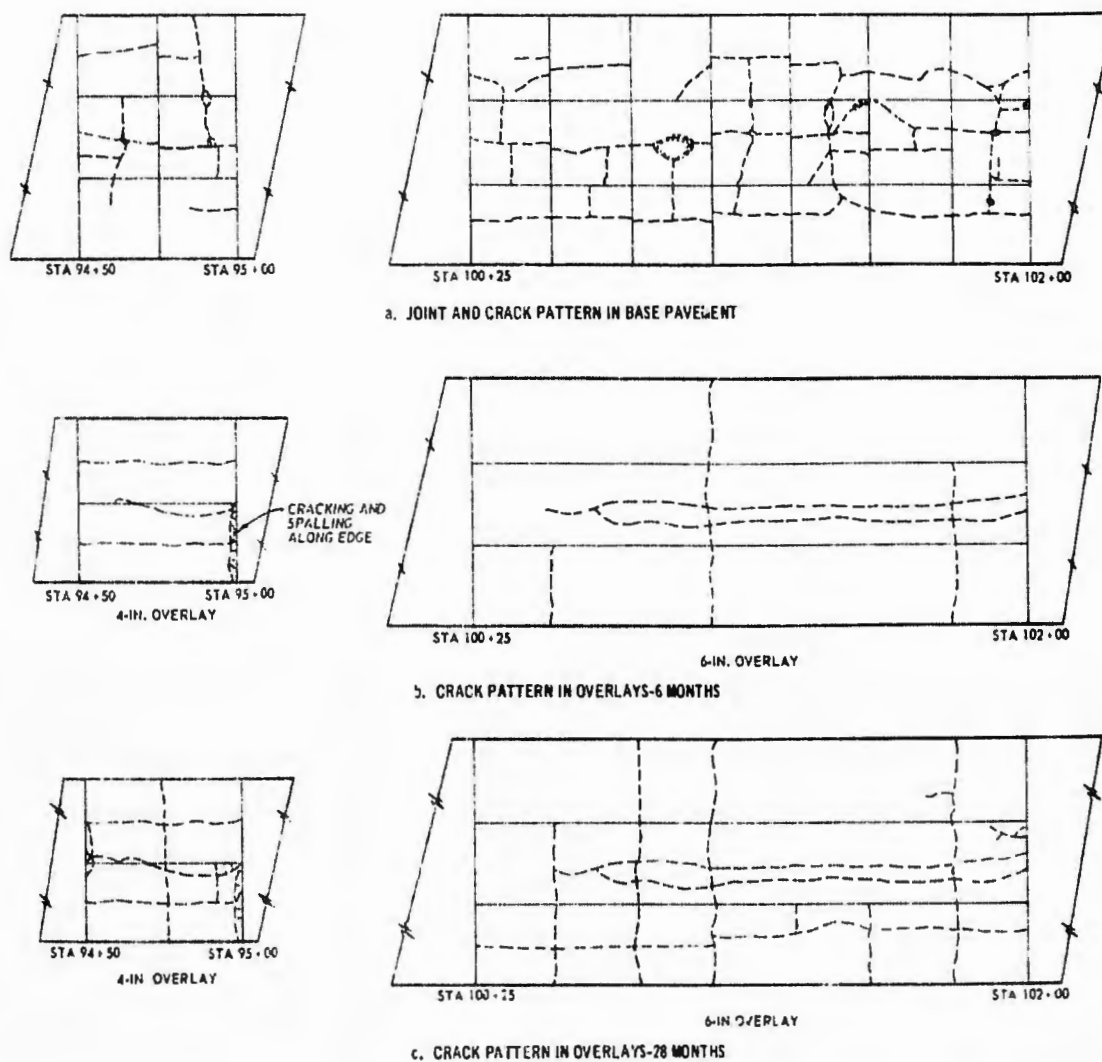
Joint and crack pattern in base pavement and overlays for the Tampa overlays
